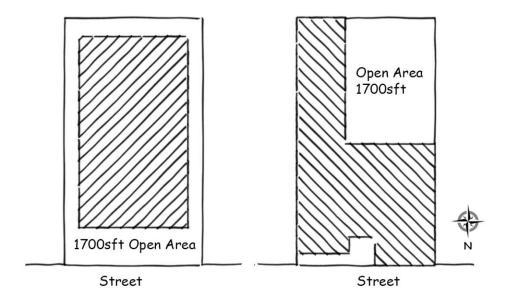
Same Open Area in Existing and Proposed Modern House (Left: Existing Modern House; Right: Proposed Modern House)
